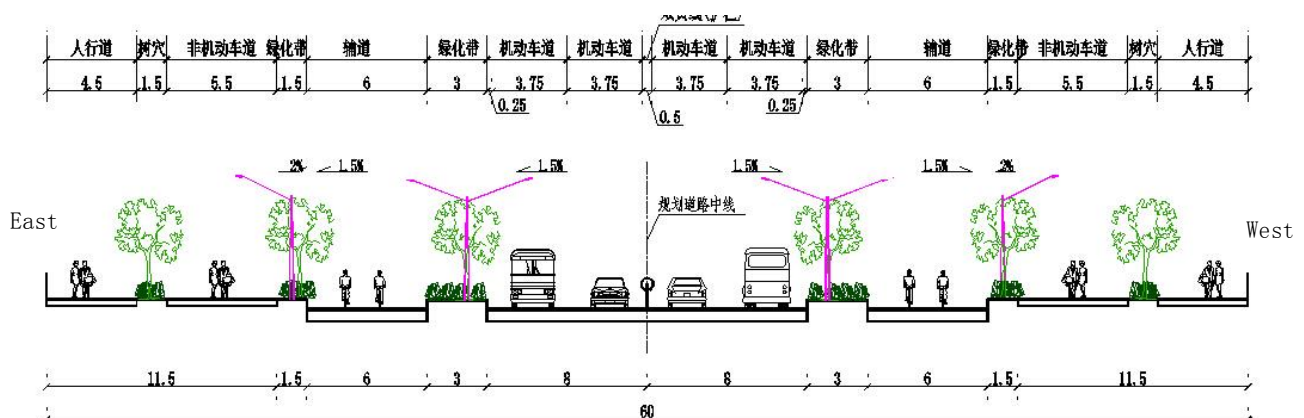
Standard Sectional View of Planed Taibai Road (Anwei Bridge to Jinqiu Avenue)
